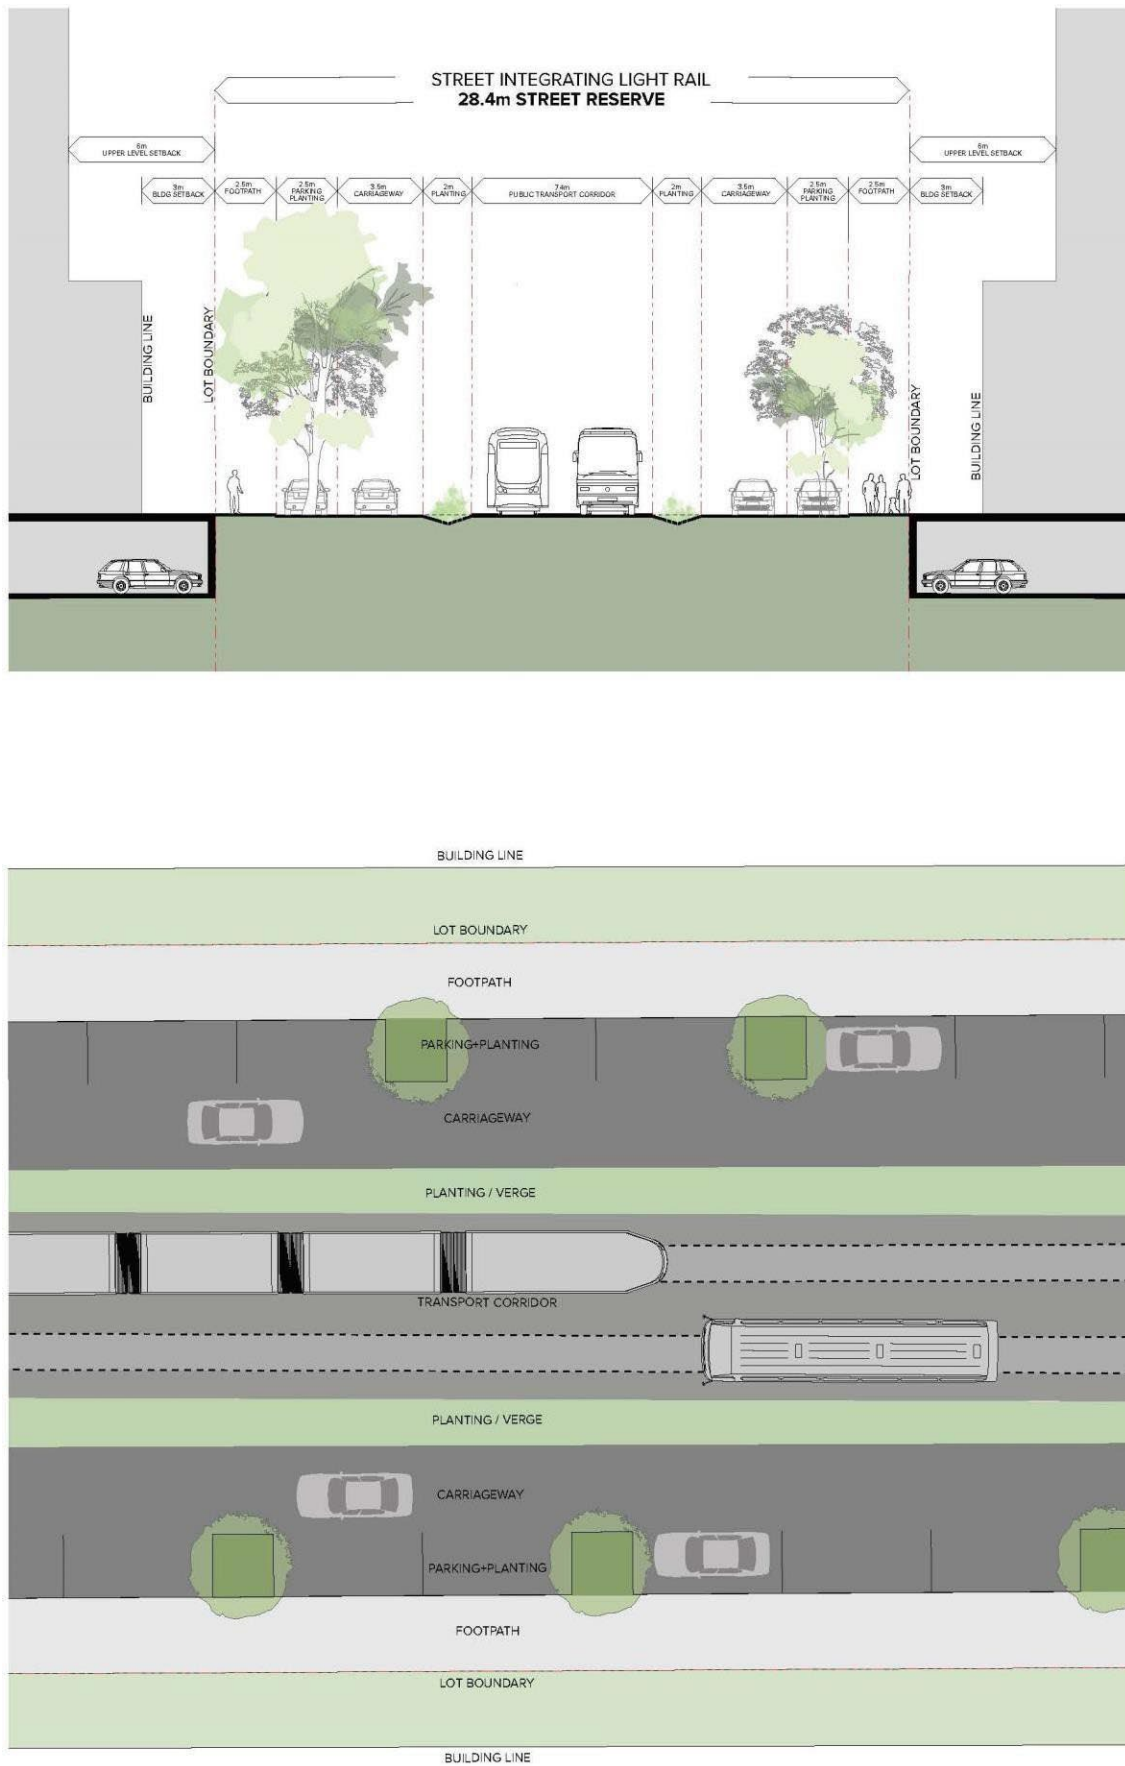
A – Street Integrating Light Rail Indicative Cross-section
